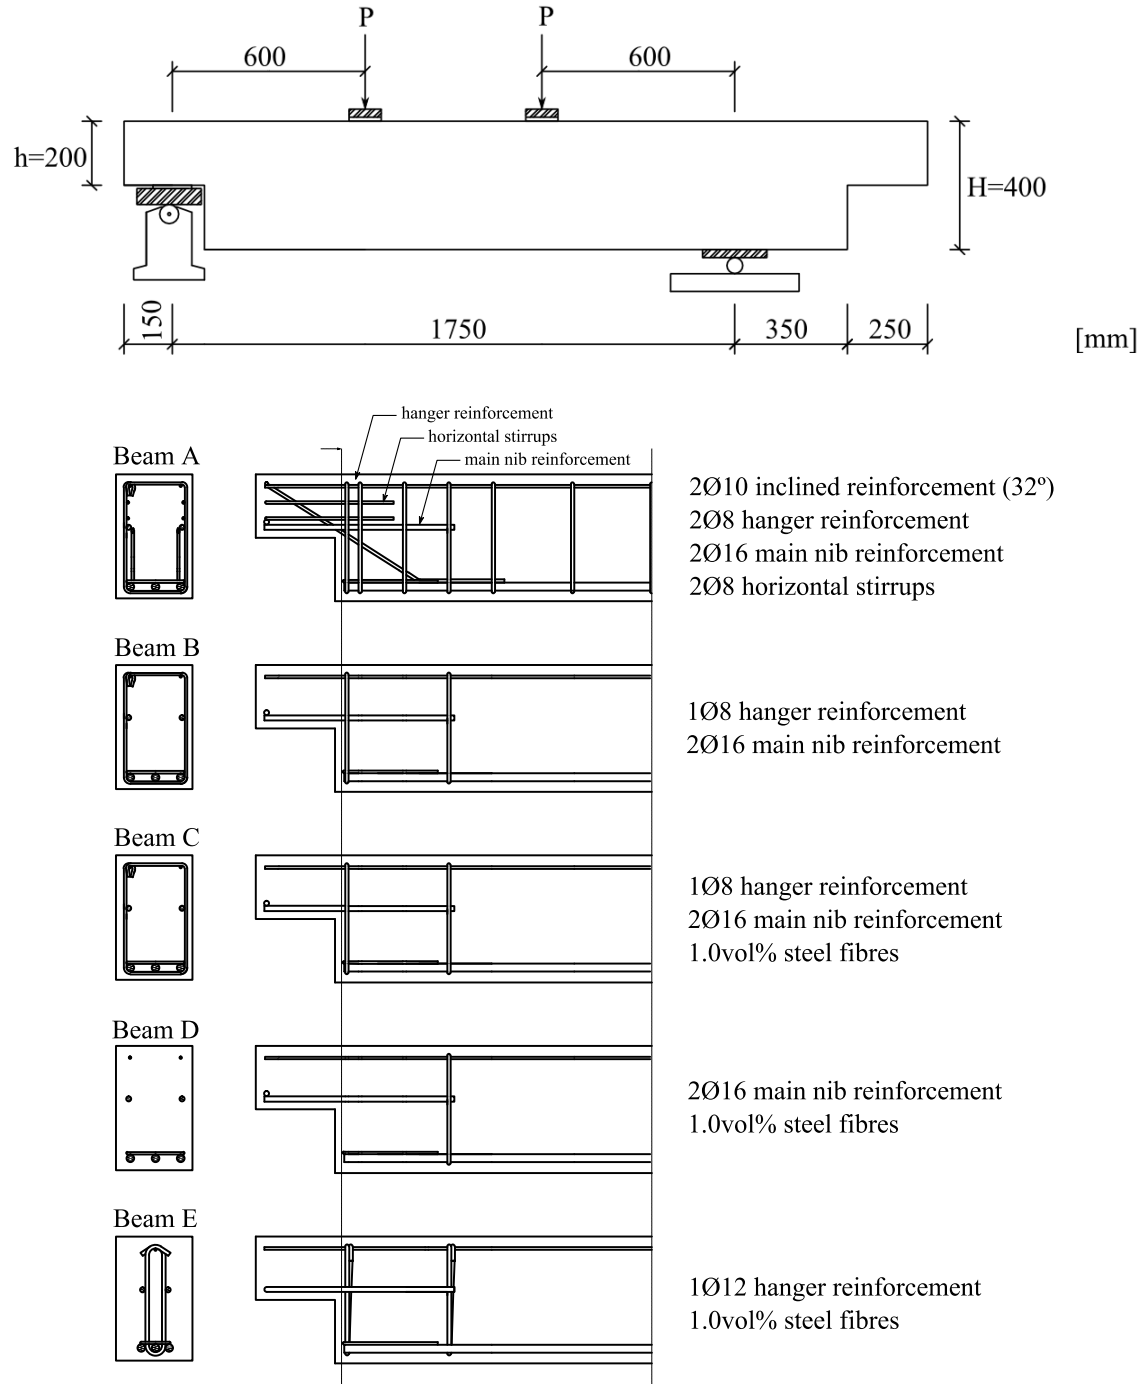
Specimen geometry, loading arrangement and reinforcement layout.
